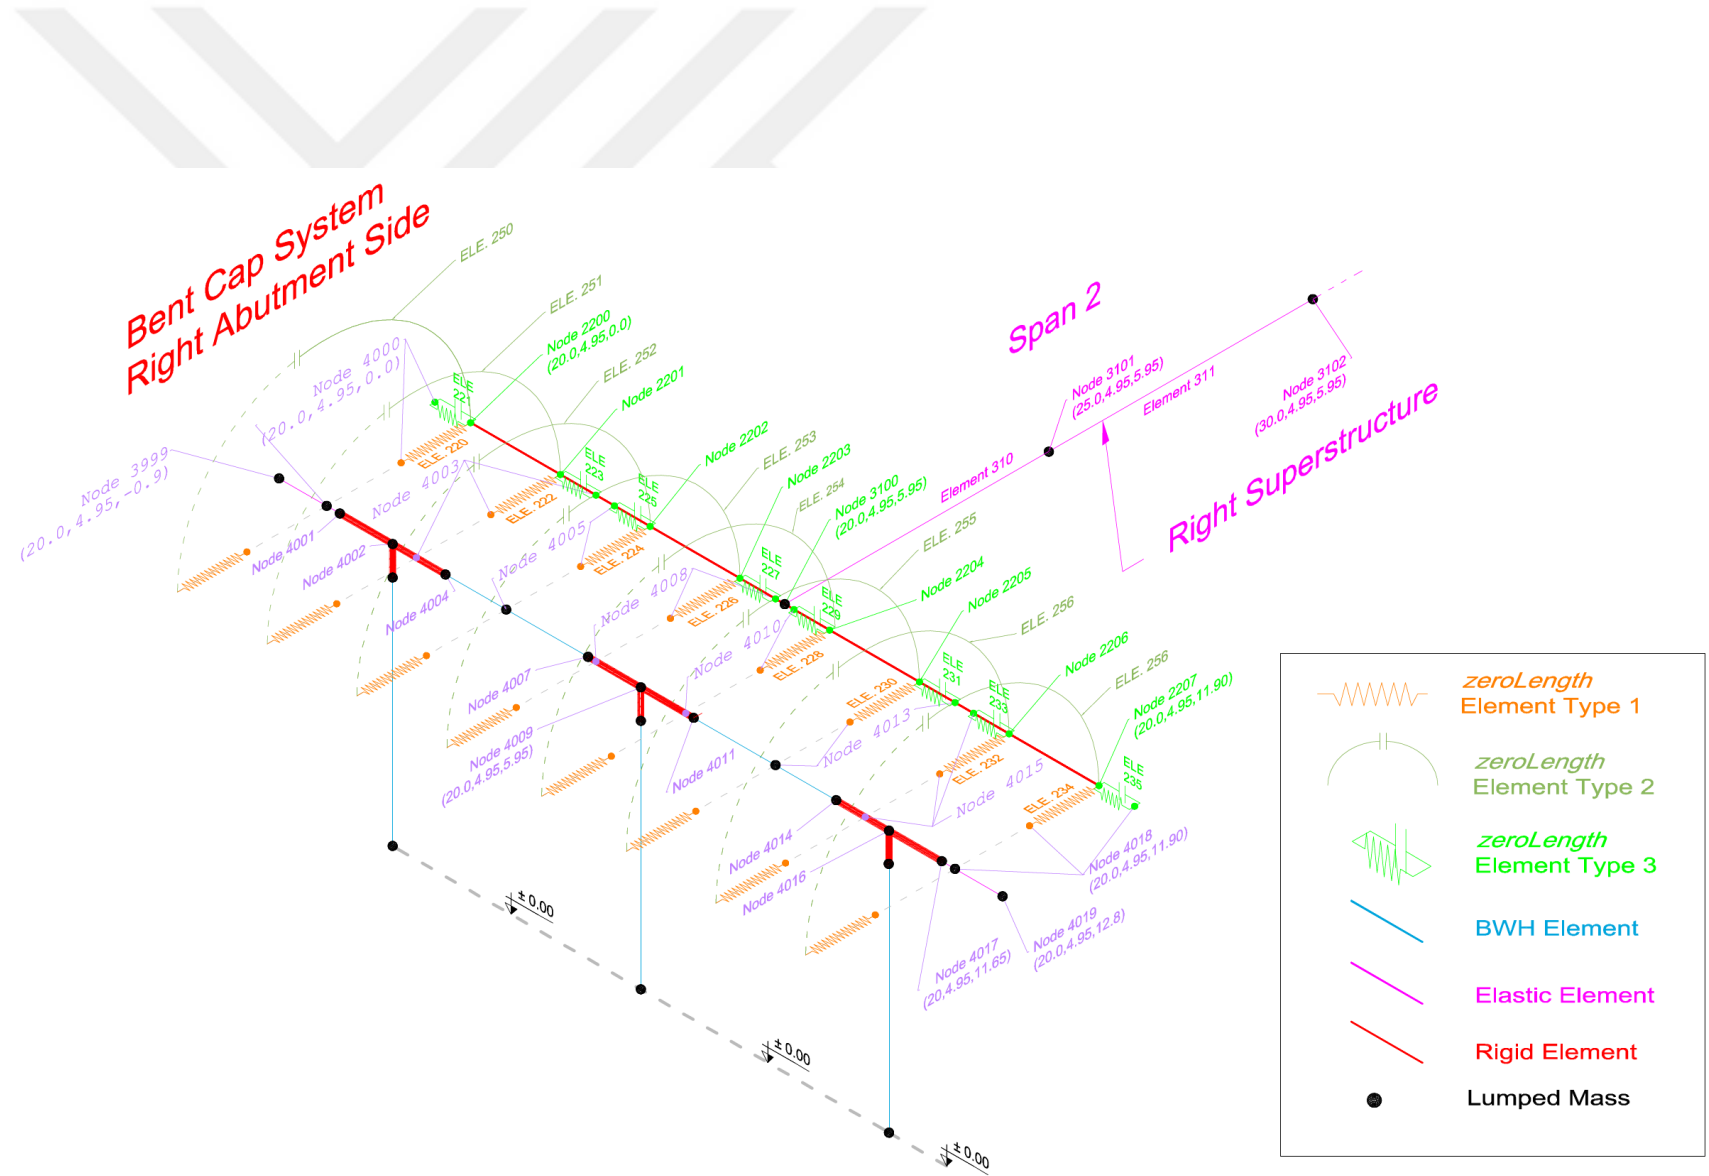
Elek Deresi Bridge analytical model – bent cap system – right abutment side.
